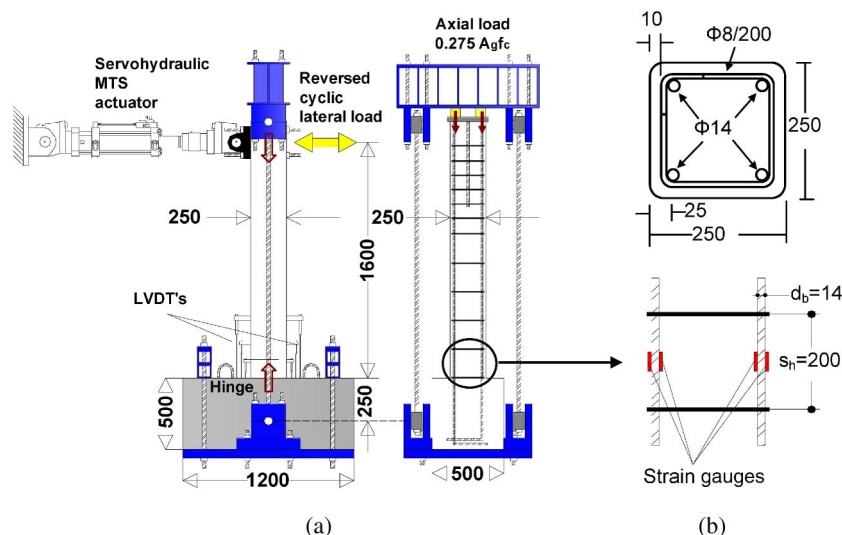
(a) Schematic of test setup; (b) cross section of columns and position of strain gauges on longitudinal bars (dimensions in mm)
